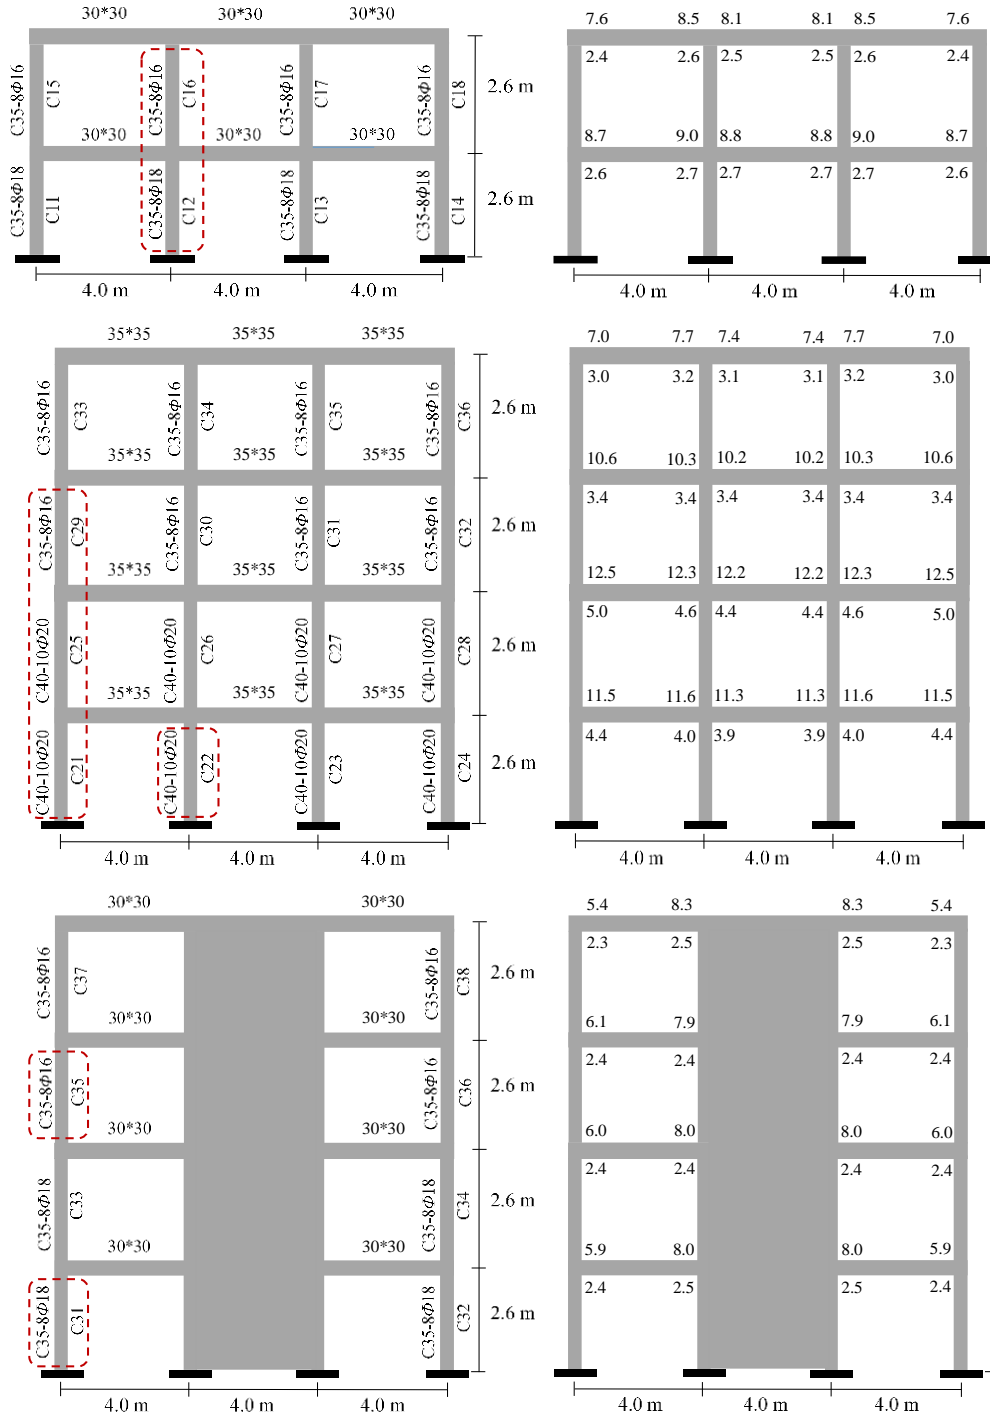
Structural sections and longitudinal reinforcement of beams in F1, F2, and F3 structures
